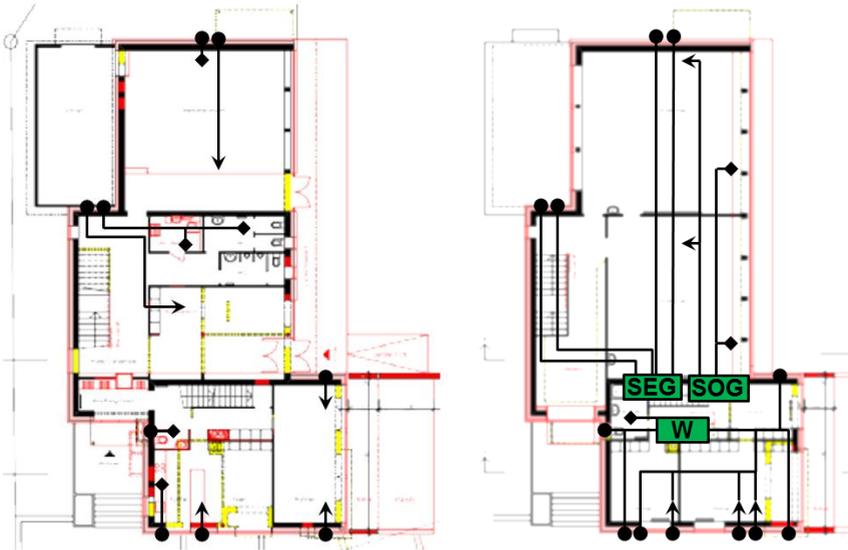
FLOOR PLANS OF THE KRUMMBACH BUILDING – LEFT: GROUND FLOOR / RIGHT: FIRST FLOOR
